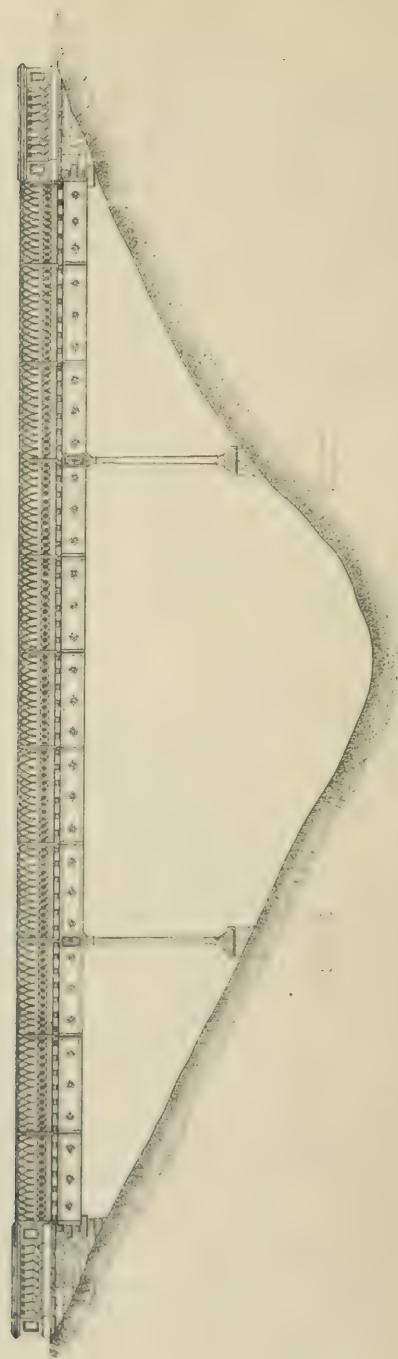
FOOT BRIDGE AT LAKE PARK. Two 30 foot Spans; One 50-foot Span.
